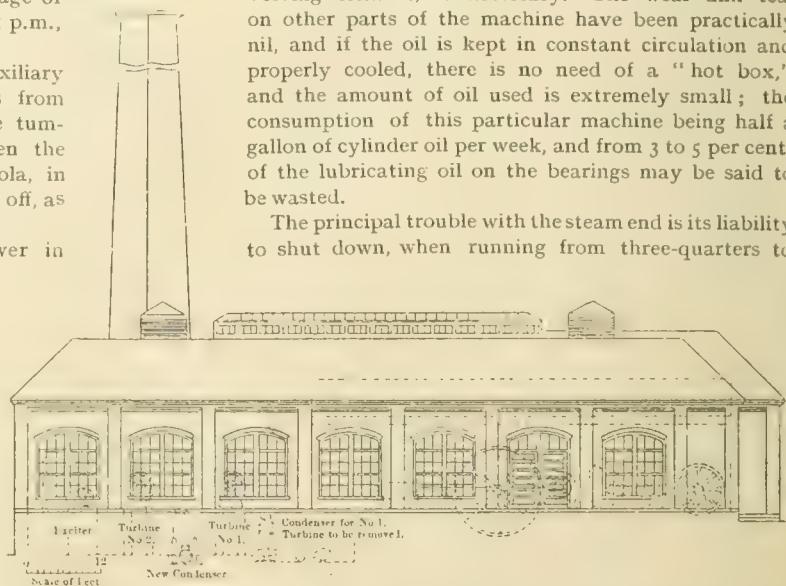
LONGITUDINAL ELEVATION OF POWER-HOUSE.
